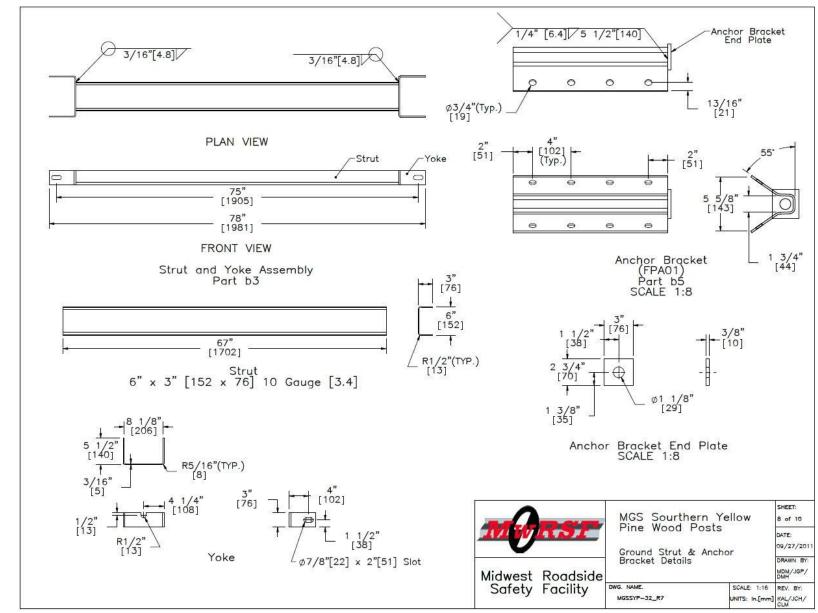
Ground Strut and Anchor Bracket Details, Test No. MGSSYP-2
